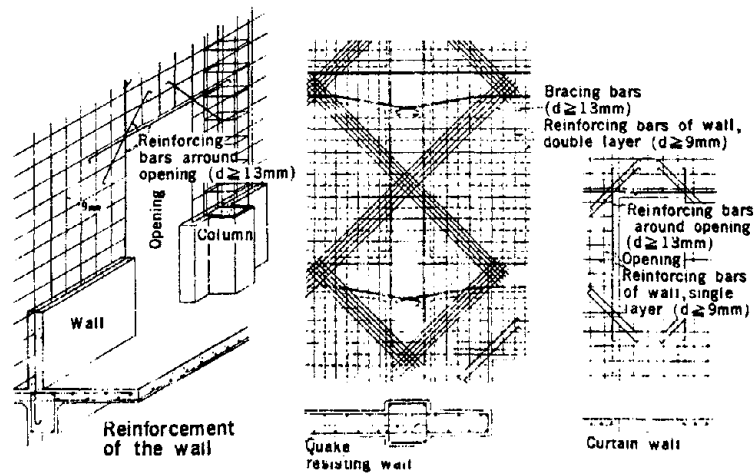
Reinforcement details for frame and frame-wall construction [AIJ, 1970]
